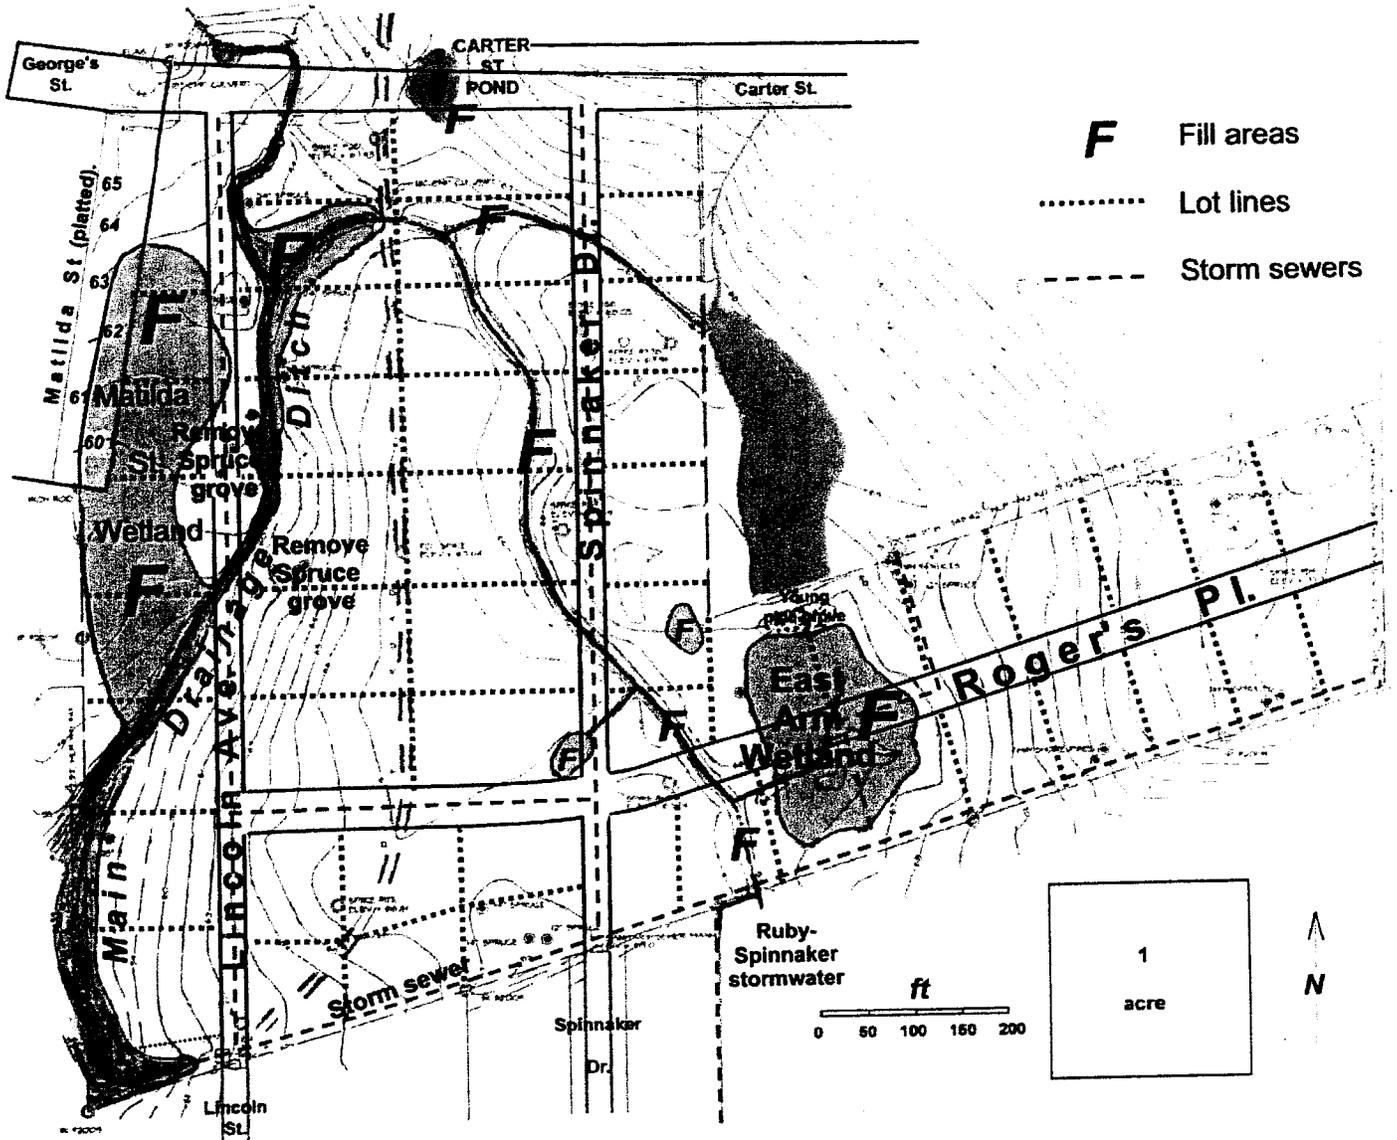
Roger's Addition, Alternative 2, Minimizing wetland impacts.
